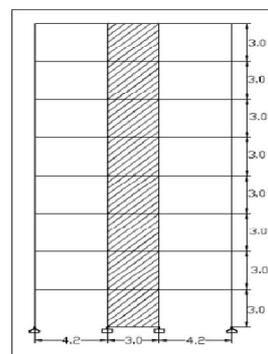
Elevation of G+6 storey steel building with SPSW
